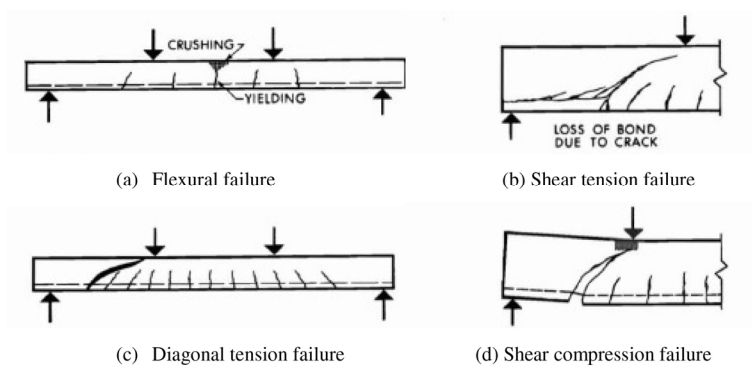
Beam failure modes [ACI-ASCE Committee 426, 1973].
